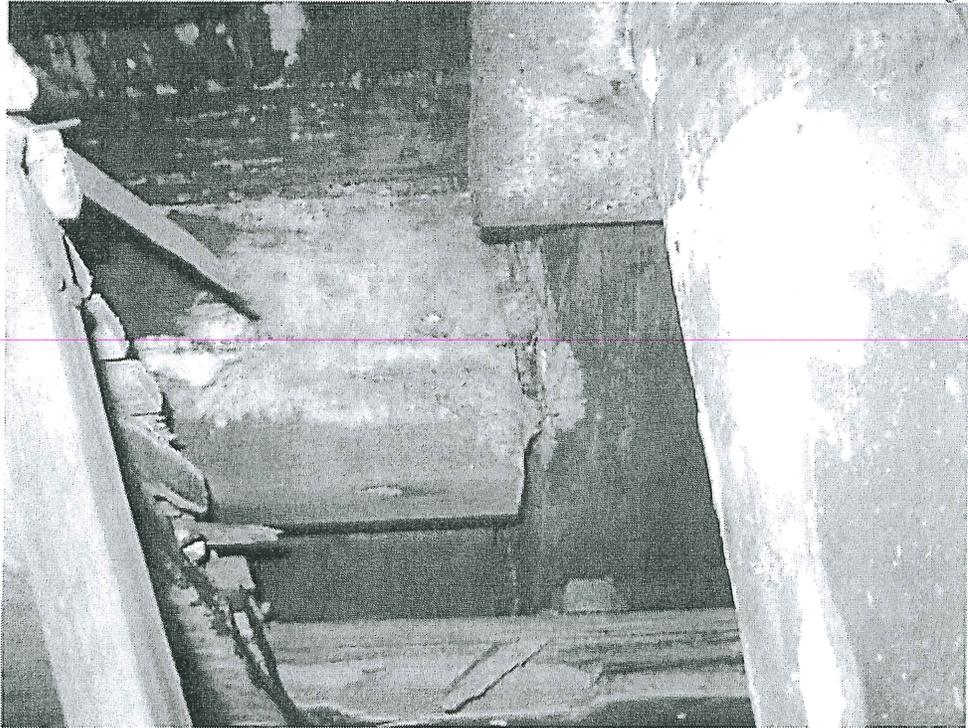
Water Damage and fruit bodies at Joist connection at 2nd floor
